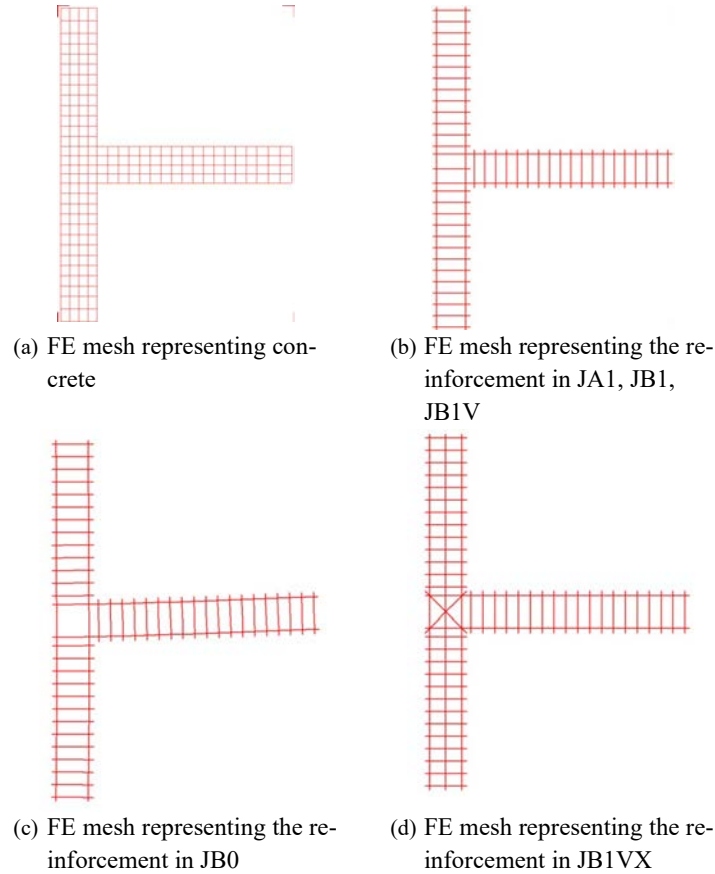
Finite element mesh adopted for modelling (a) concrete and (b-d) the reinforcement of the specimens considered.
